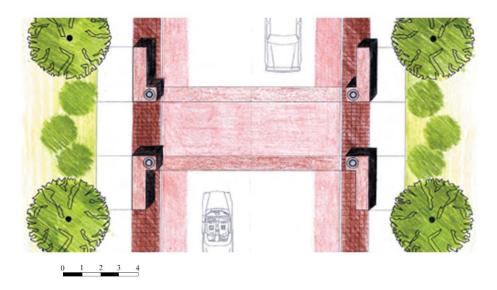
Typical Campus Street Layout at a Crosswalk in UNB Fredericton Campus. UNB Fredericton Campus Plan P.79
